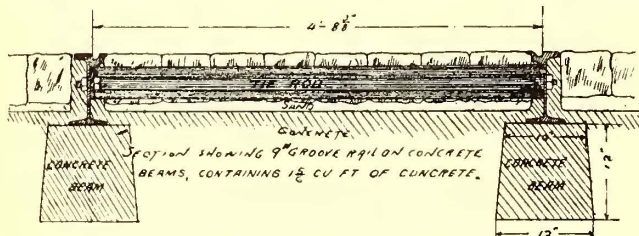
CONCRETE BEAM CONSTRUCTION
